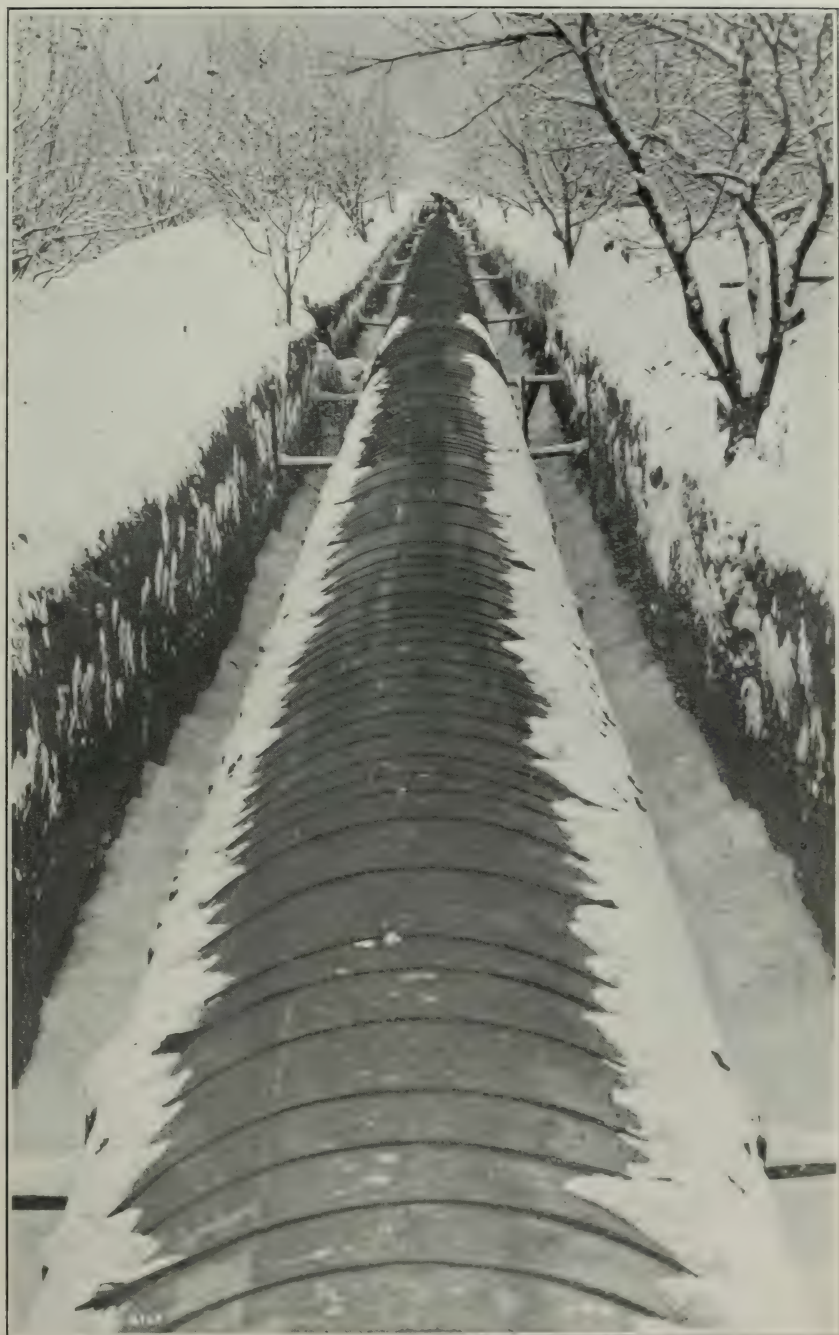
Short Section of Wenatchee Pipe Line Before Backfilling
